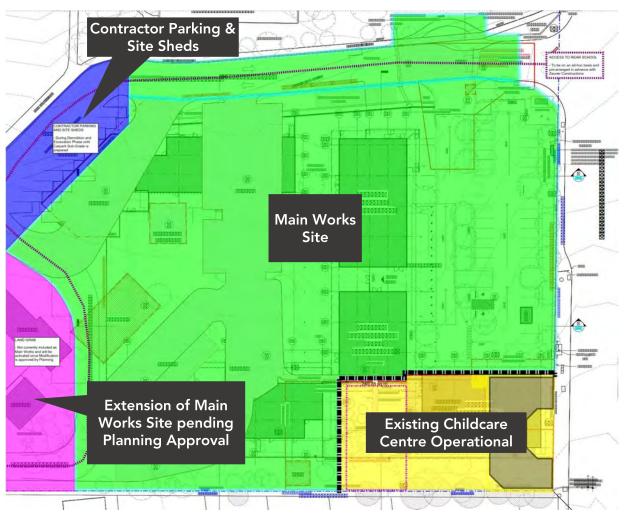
Stage 1 Main Works Staging Plan (Source: Zauner Construction)
